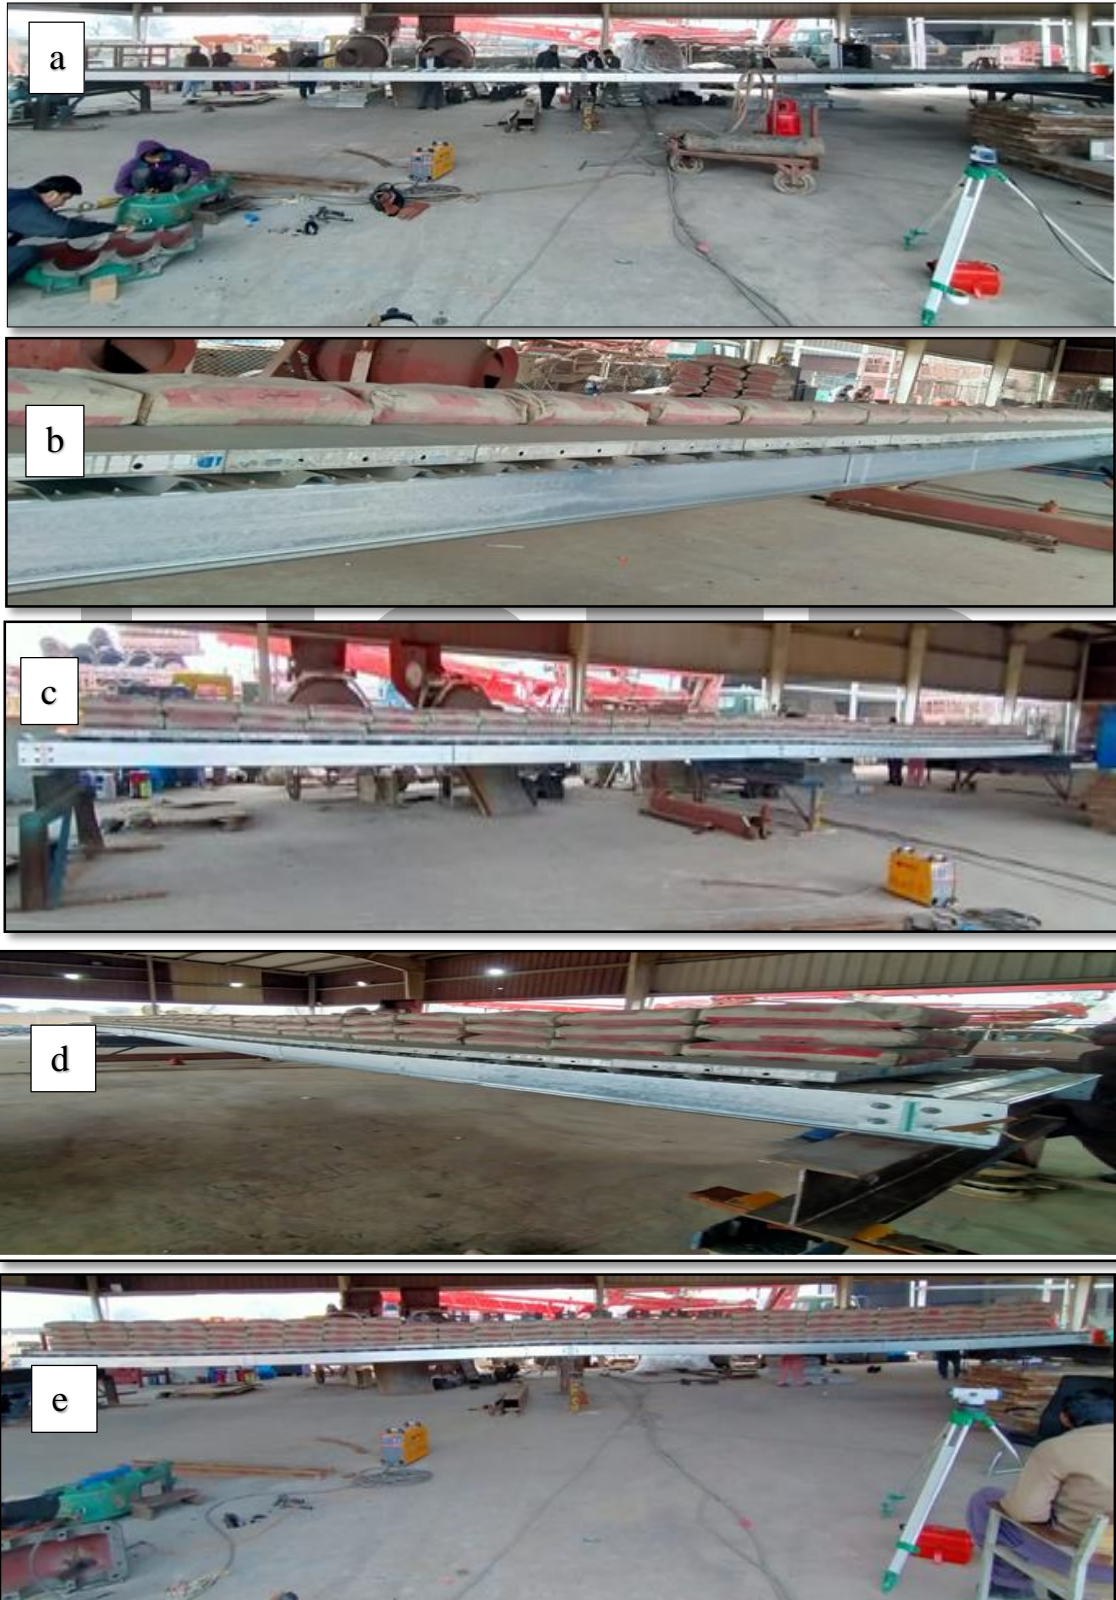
Application of (a) self-weight, (b) 1st step loading, (c) 2nd step loading, (d) 3rd step loading, (e) 4th step loading (Experiment)
